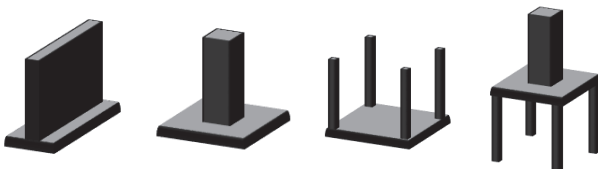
Typology of the most common types of foundations: strip footing; spread footing; mat (raft); piles
